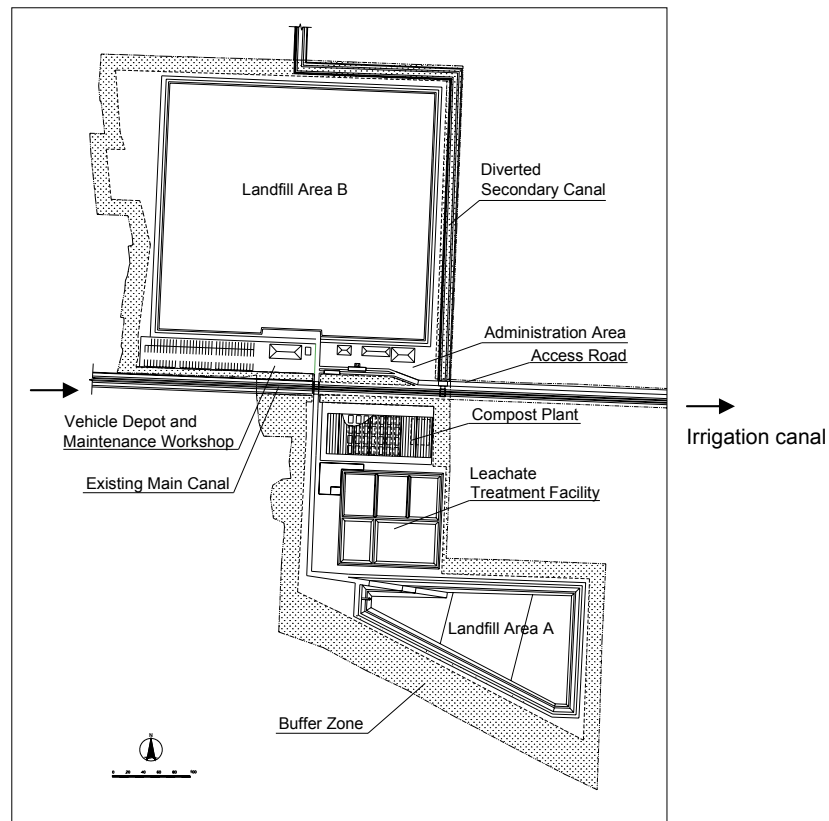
Layout Plan of Dang Kor Disposal Site (Phase1)
